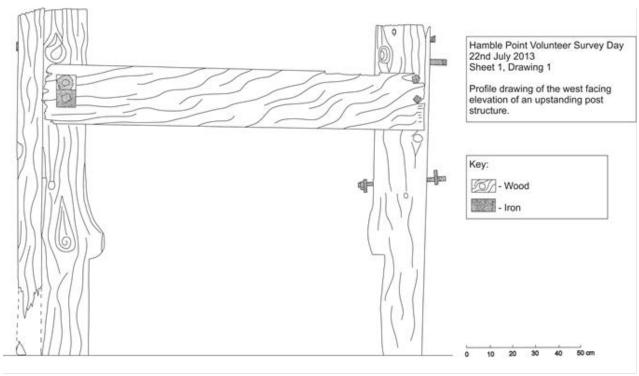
PROFILE OF THE WEST FACING ELEVATION OF UPSTANDING POST STRUCTURE
